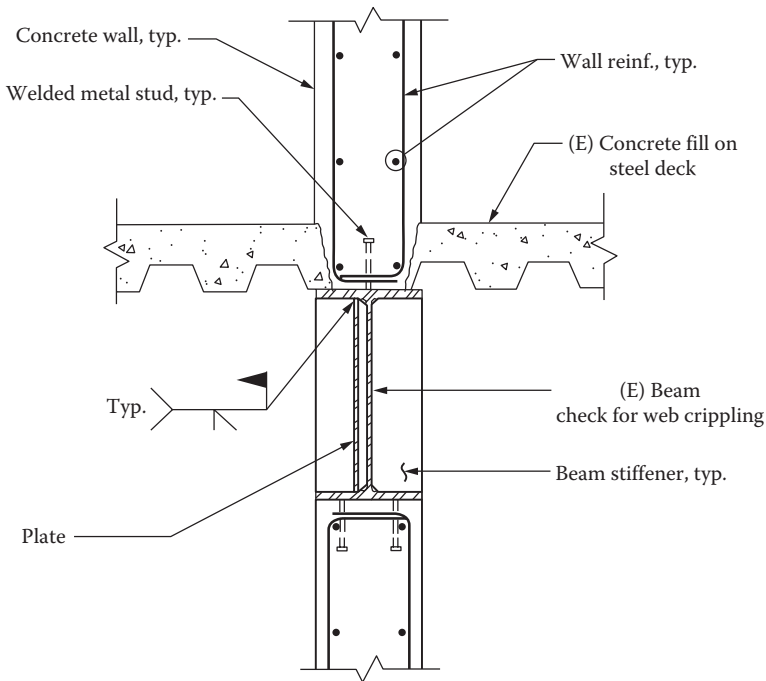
Discontinuous wall at existing beam. *Notes:* 1. Detail is appropriate for shotcrete construction and more problematic for cast-in-place concrete construction due to concrete placement and vibrating challenges. 2. Shear in wall is transferred entirely through studs. 3. For deck perpendicular to beam condition, number of metal studs limited by deck flute spacing.
